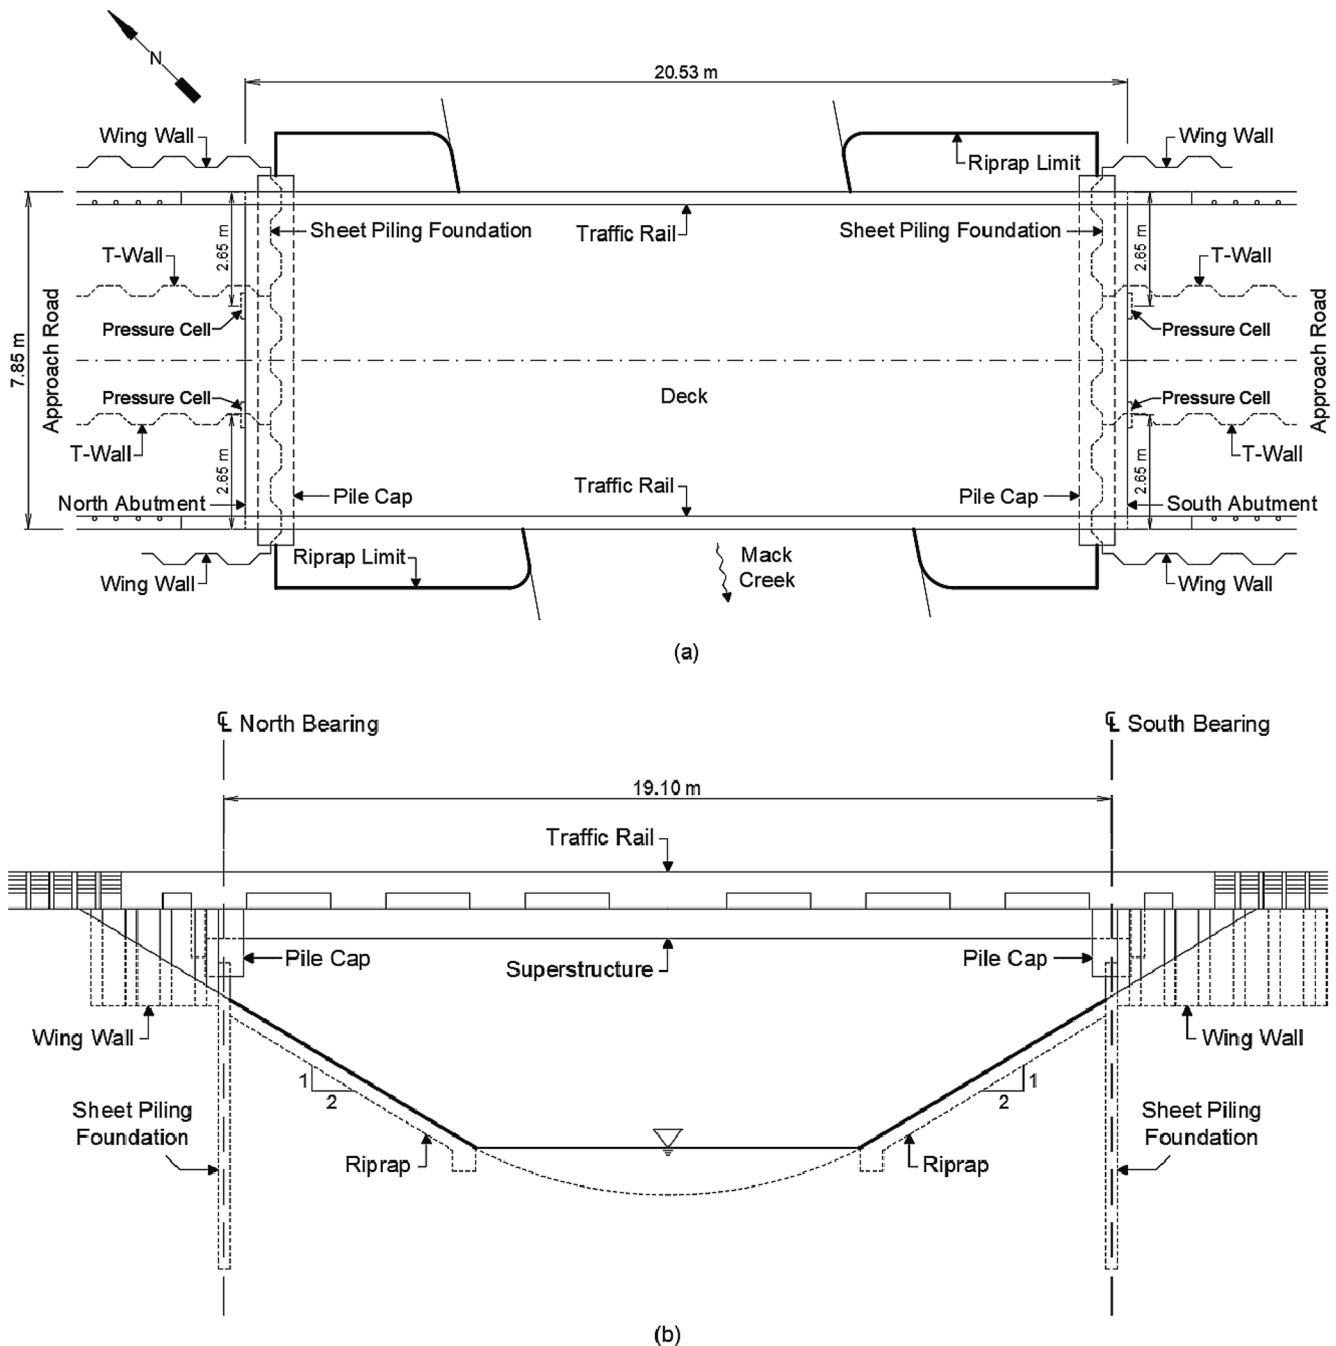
Schematic views of the bridge: (a) plan view; (b) elevation view.
